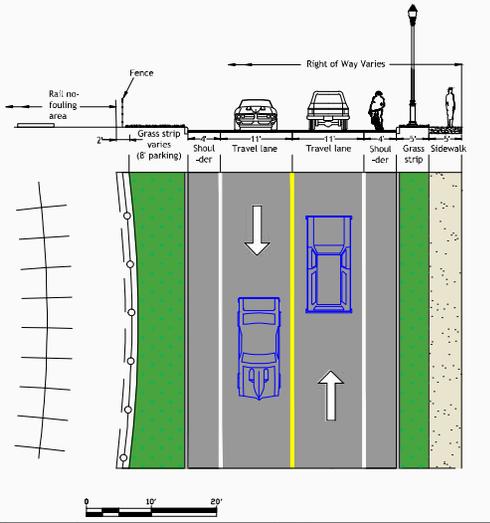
B: Phase B - Railroad Street with Partial Sidewalk (Alternative 3)
